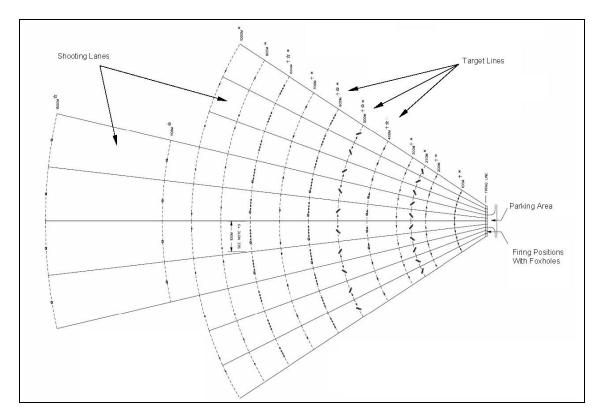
Army-Standard Multipurpose Machine Gun Range
